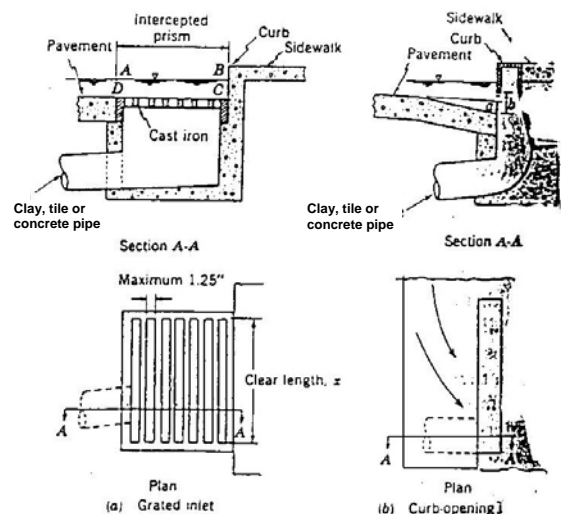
SOME TYPICAL STORM DRAIN INLETS
